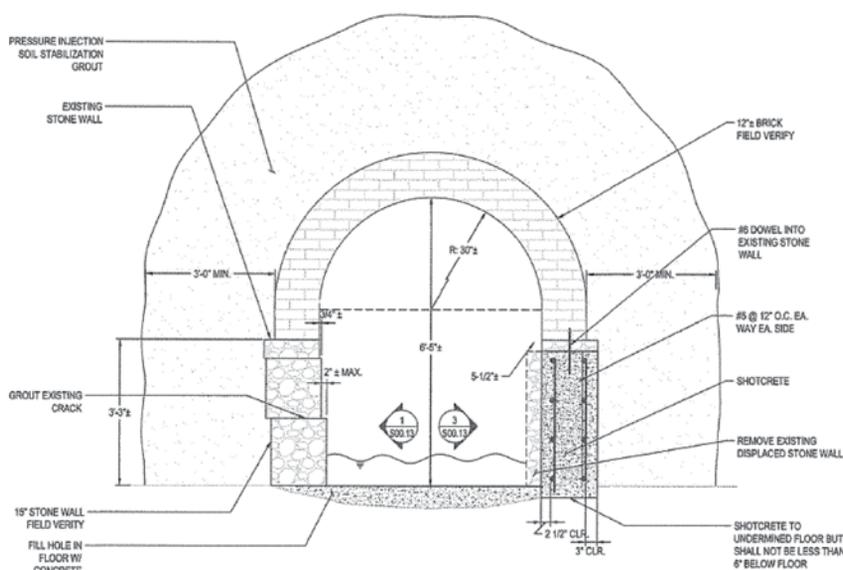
Example of specification drawings for Columbia Canal Tunnel Lining Project
